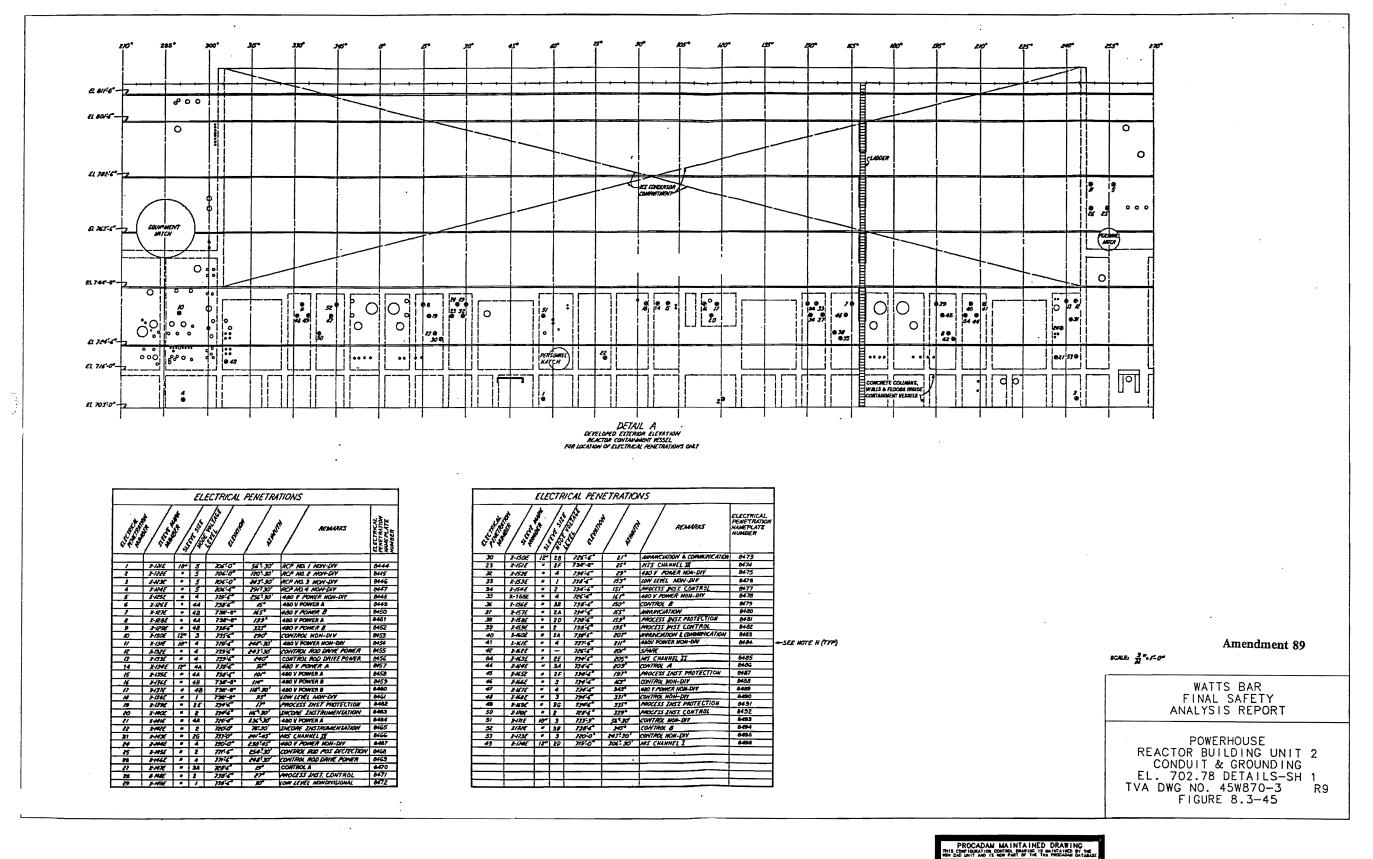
owerhouse Reactor Building Unit 2 Conduit and Grounding EL 702.78 Details -Sheet 1
